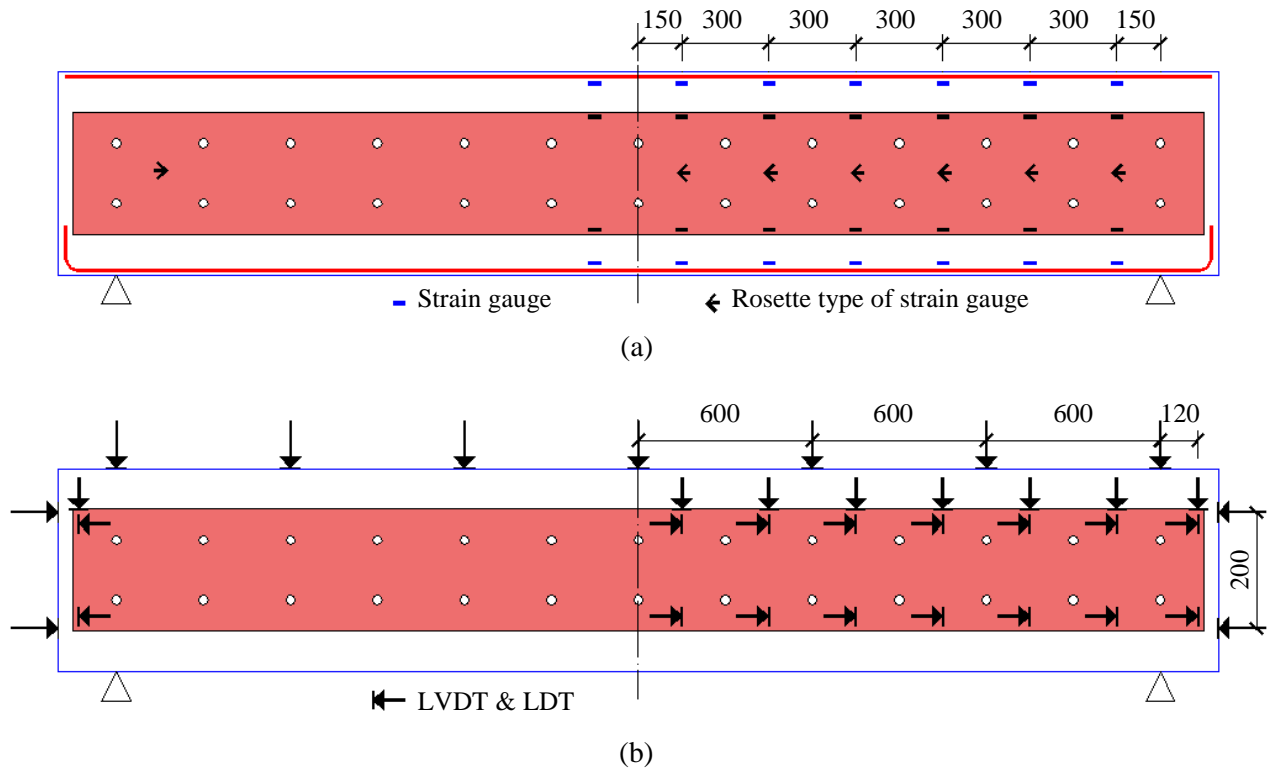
Arrangements of (a) strain gauges and (b) LVDTs & LDTs (dimensions in millimeters)
